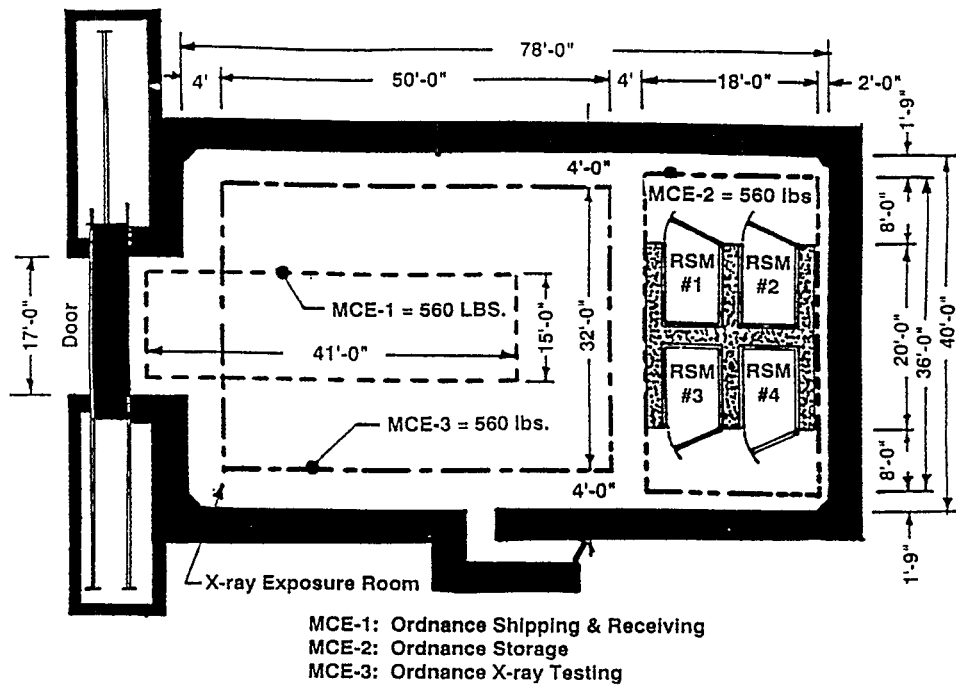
Floor plan and MCE envelopes - Radiography Building 35, Pittsburgh, CA.
